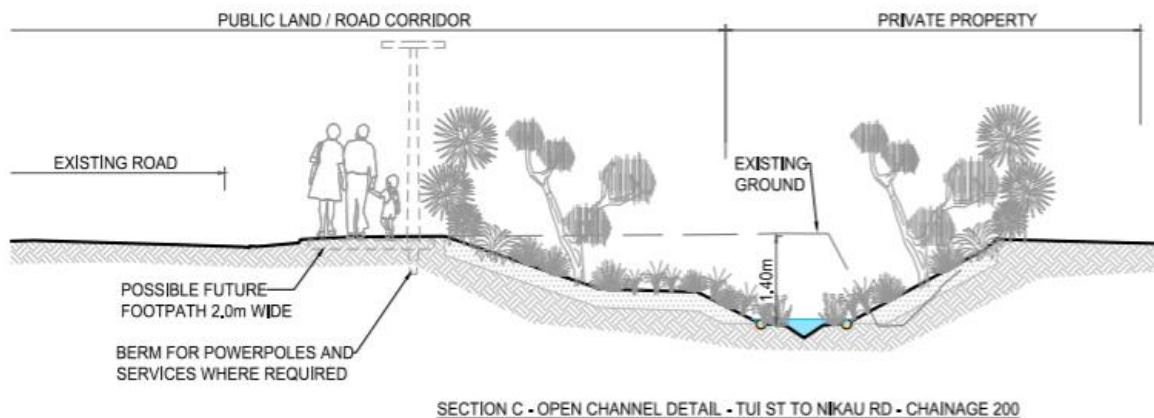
Cross Section of works at 30 Tui Street (Source: Healthy Waters, Appendix B)
